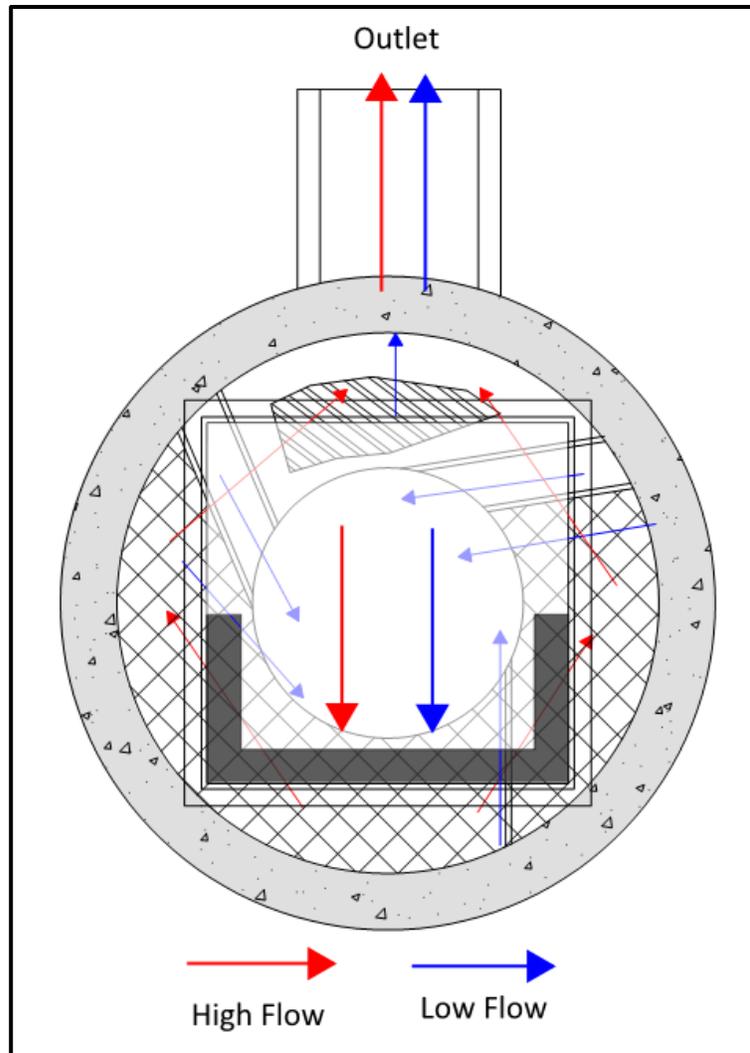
Hydroworks HydroStorm Operation – Plan View
